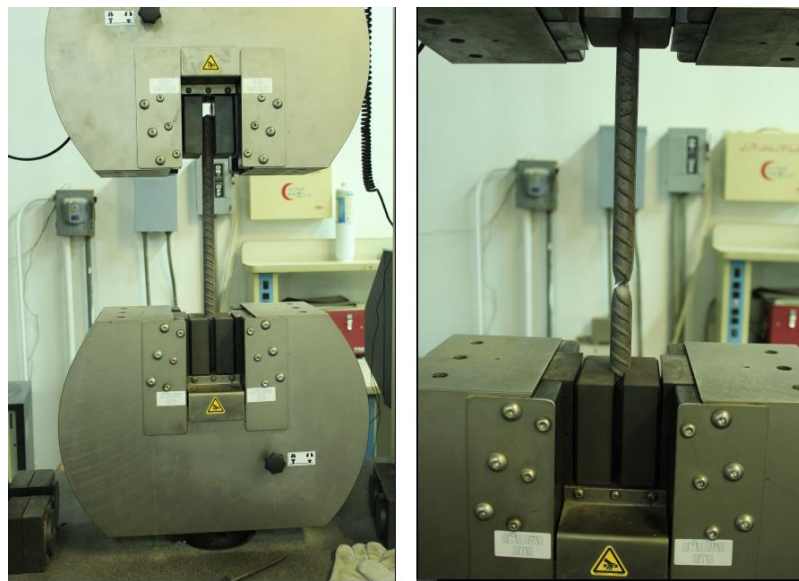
Uniaxial tensile test setup (Left) and failure mode of rebar (Right)
